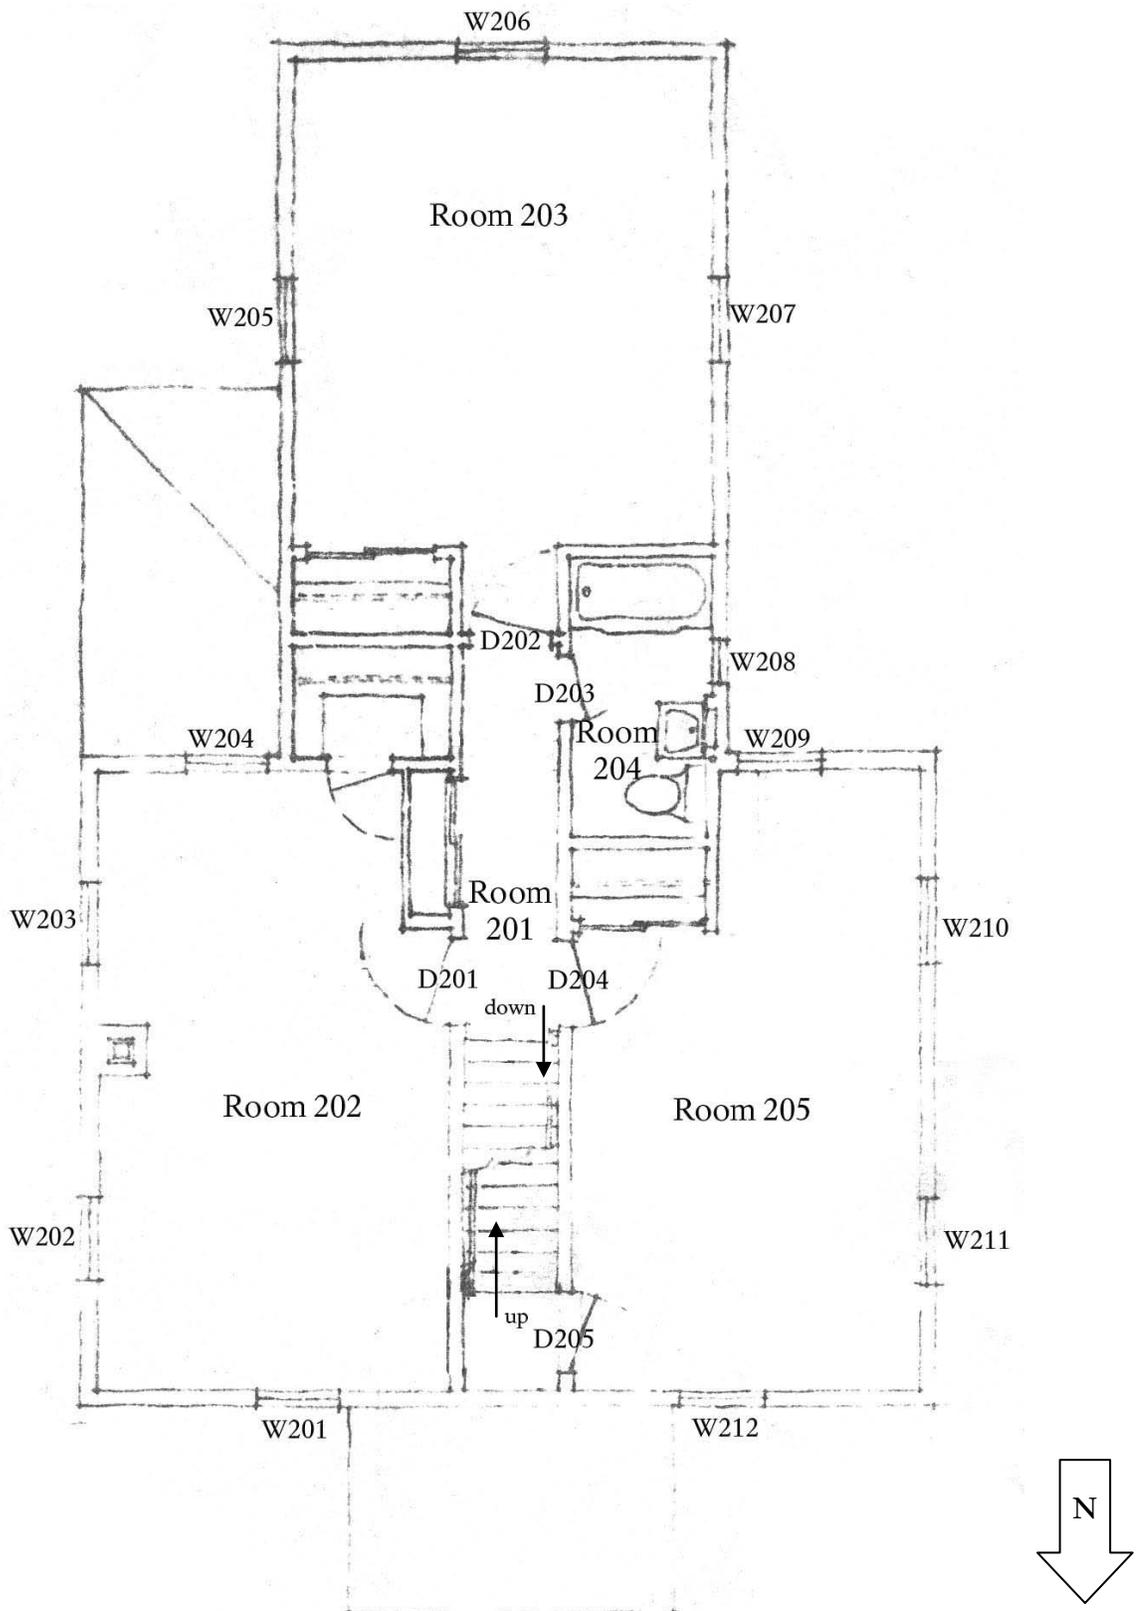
Gray Cottage, second-story floor plan with room, doorway, and window-opening numbers assigned for the current project.
